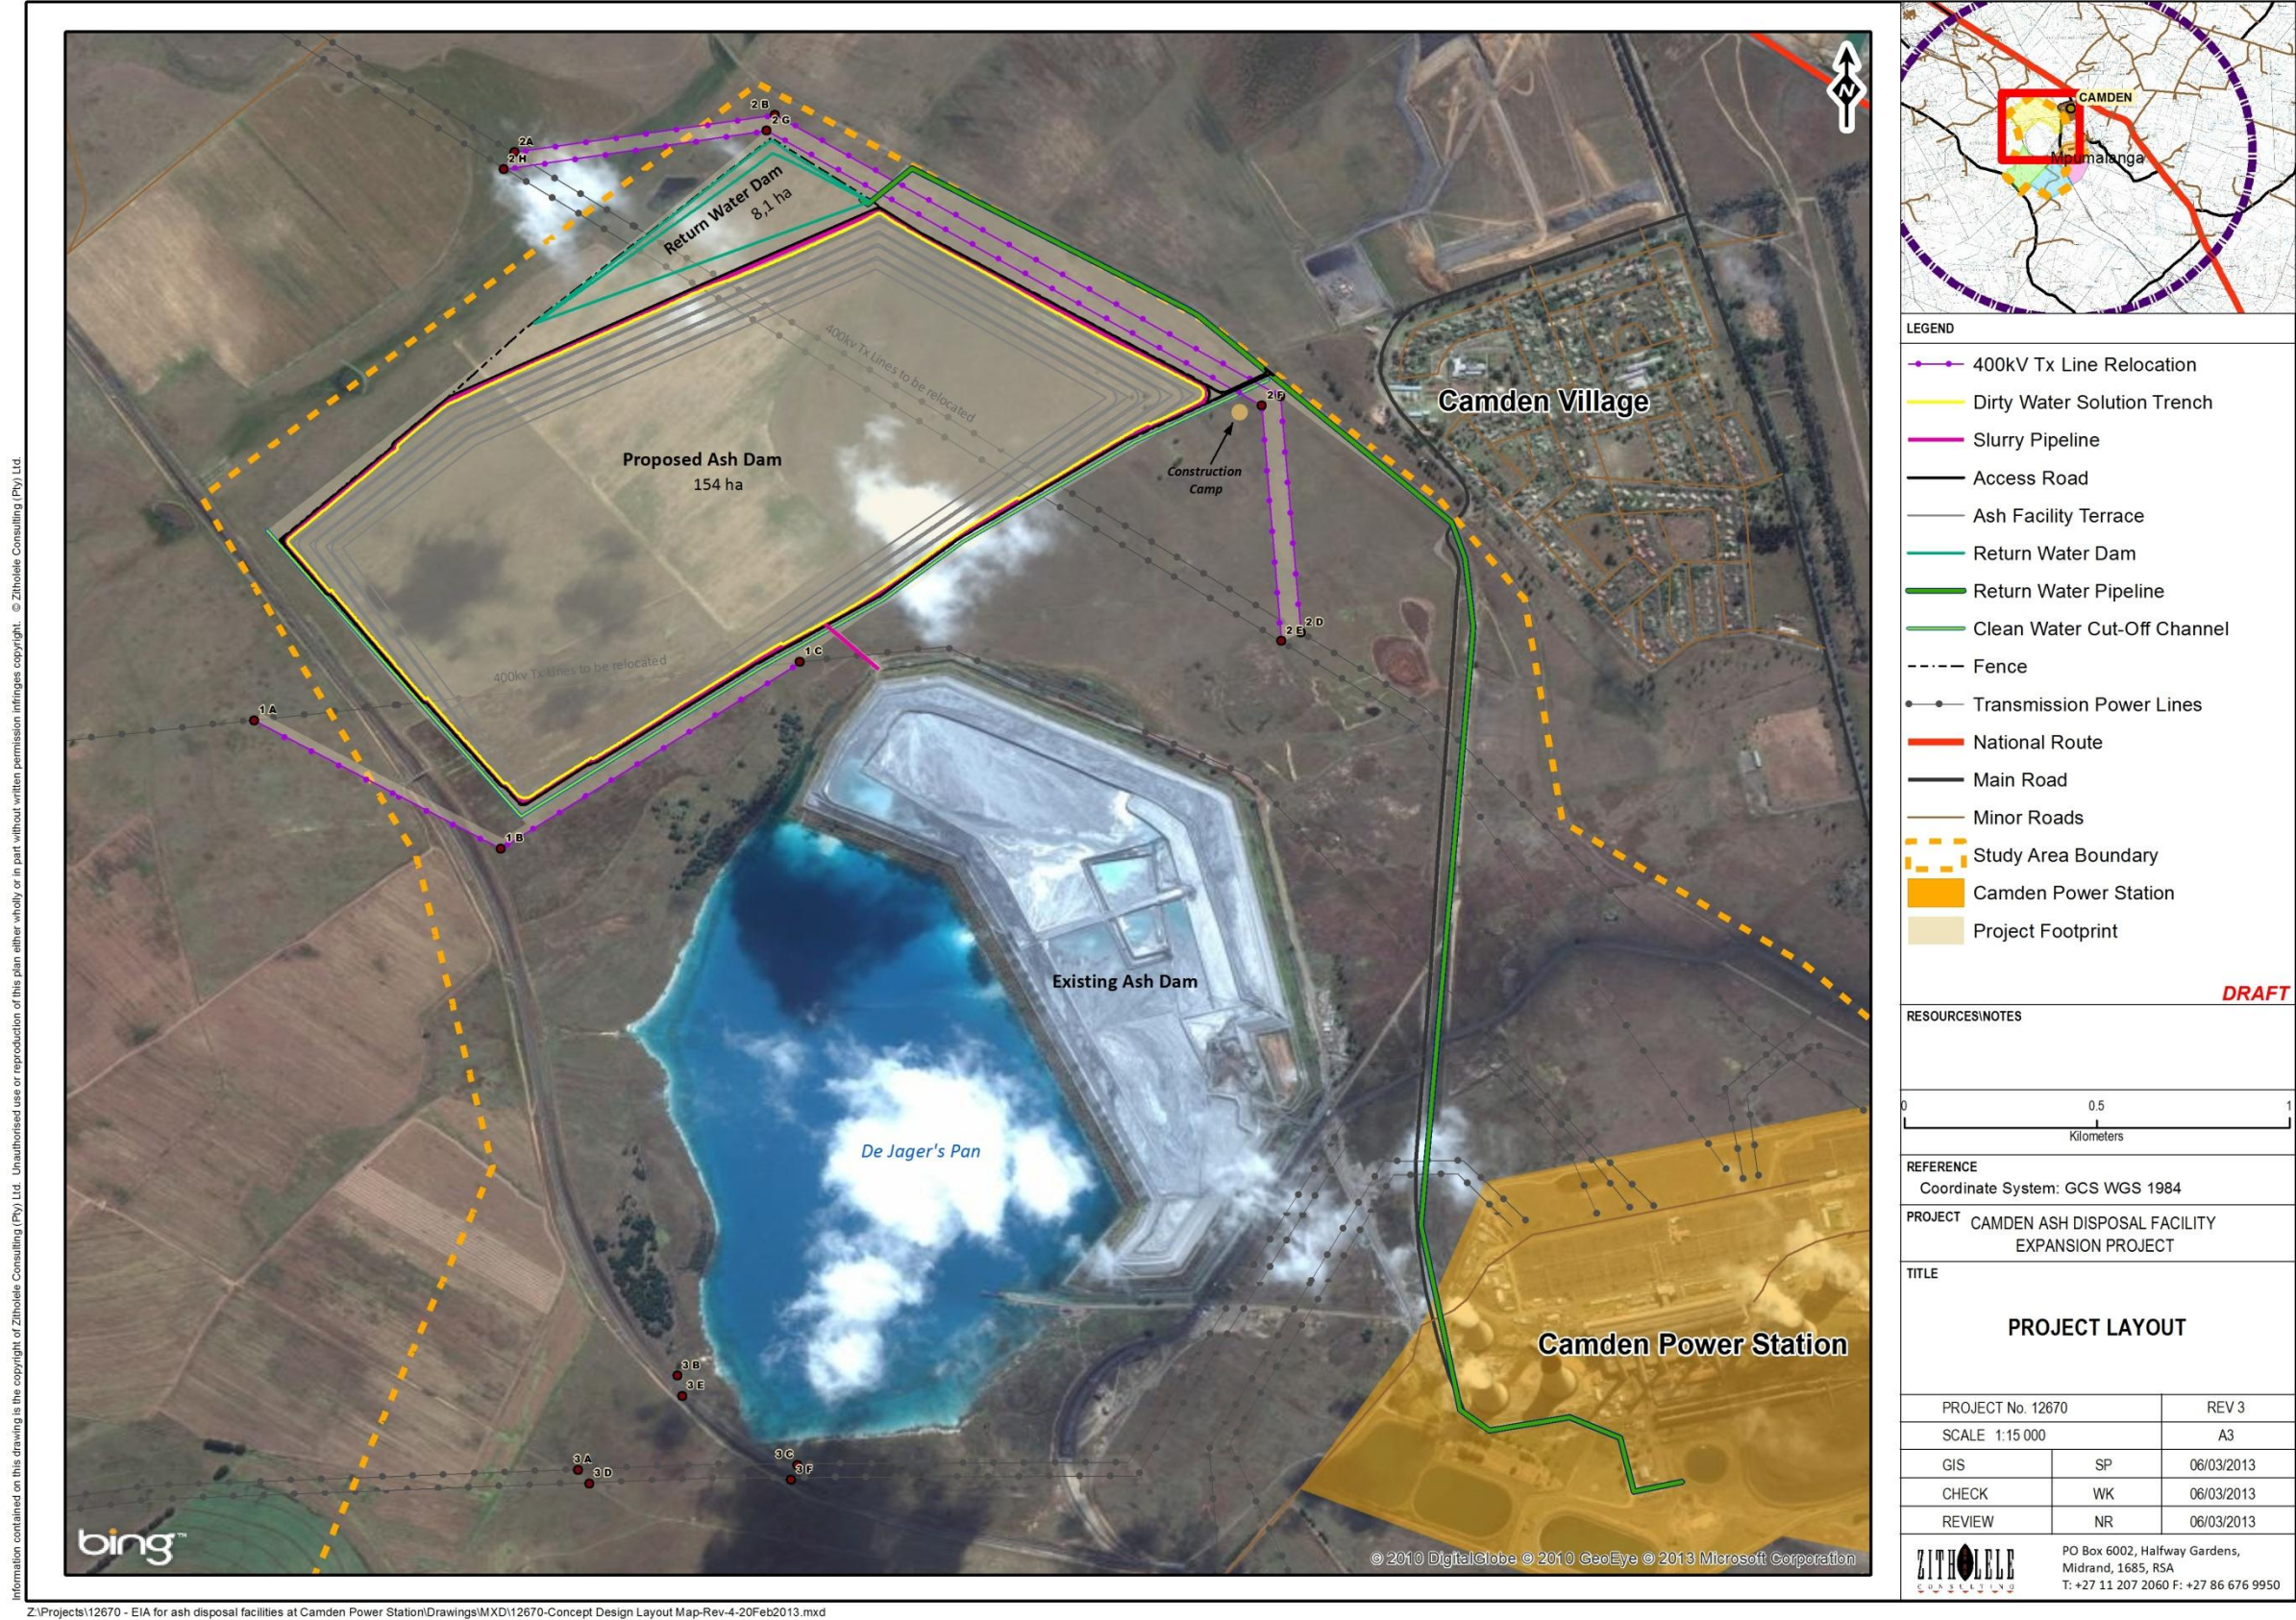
Camden Ash Disposal Facility Expansion Project Layout Map for Site 1
